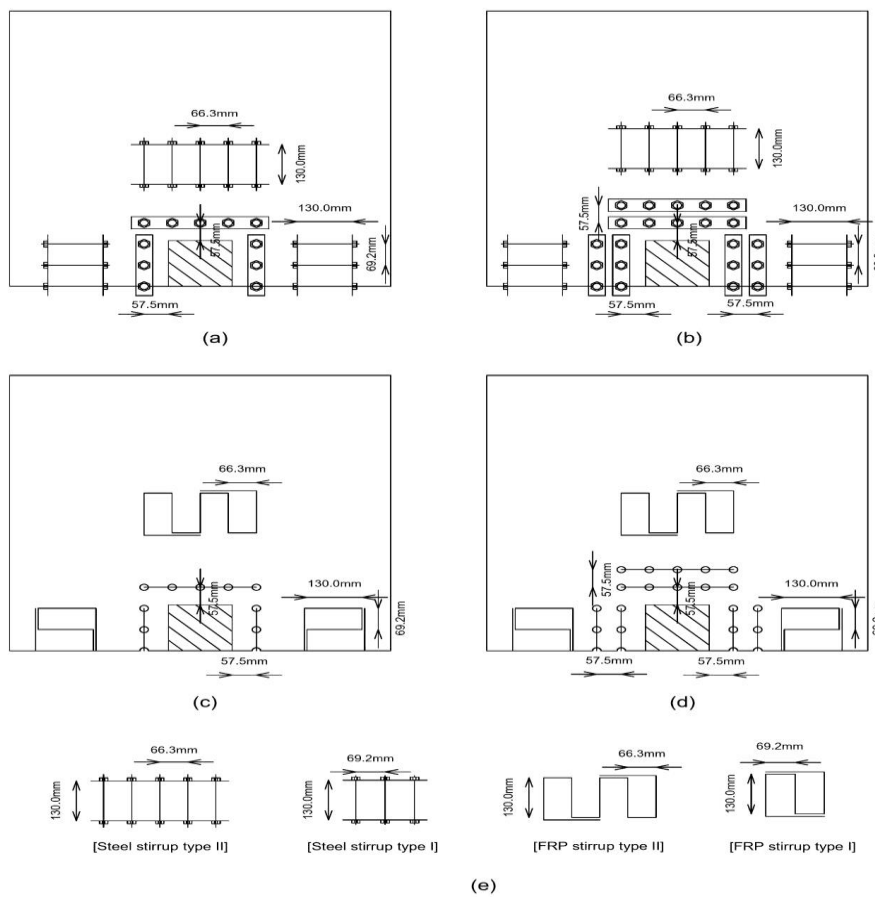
Details of strengthening systems; Using one row of steel links (a), steel two rows (b), FRP one row of stirrups (c), FRP two rows stirrups (d) Details of stirrups types (e) [1].
